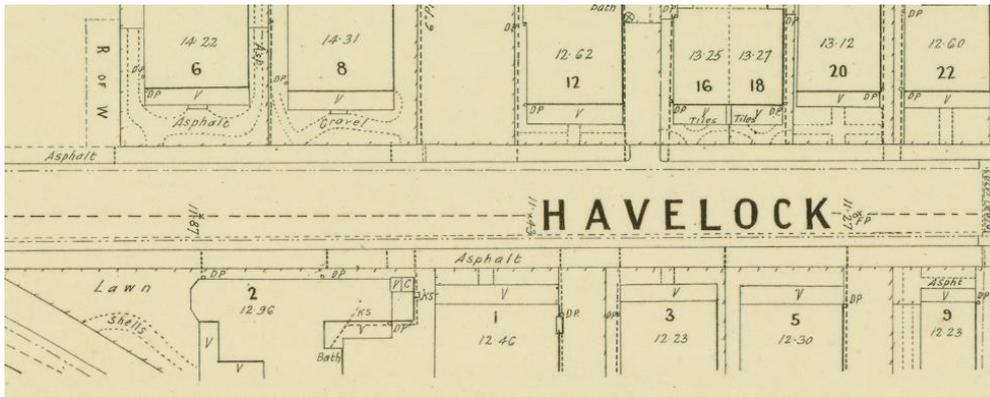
MMBW Detail Plan No. 1369. 1897. Scale 40 feet:1 inch (1:480).
